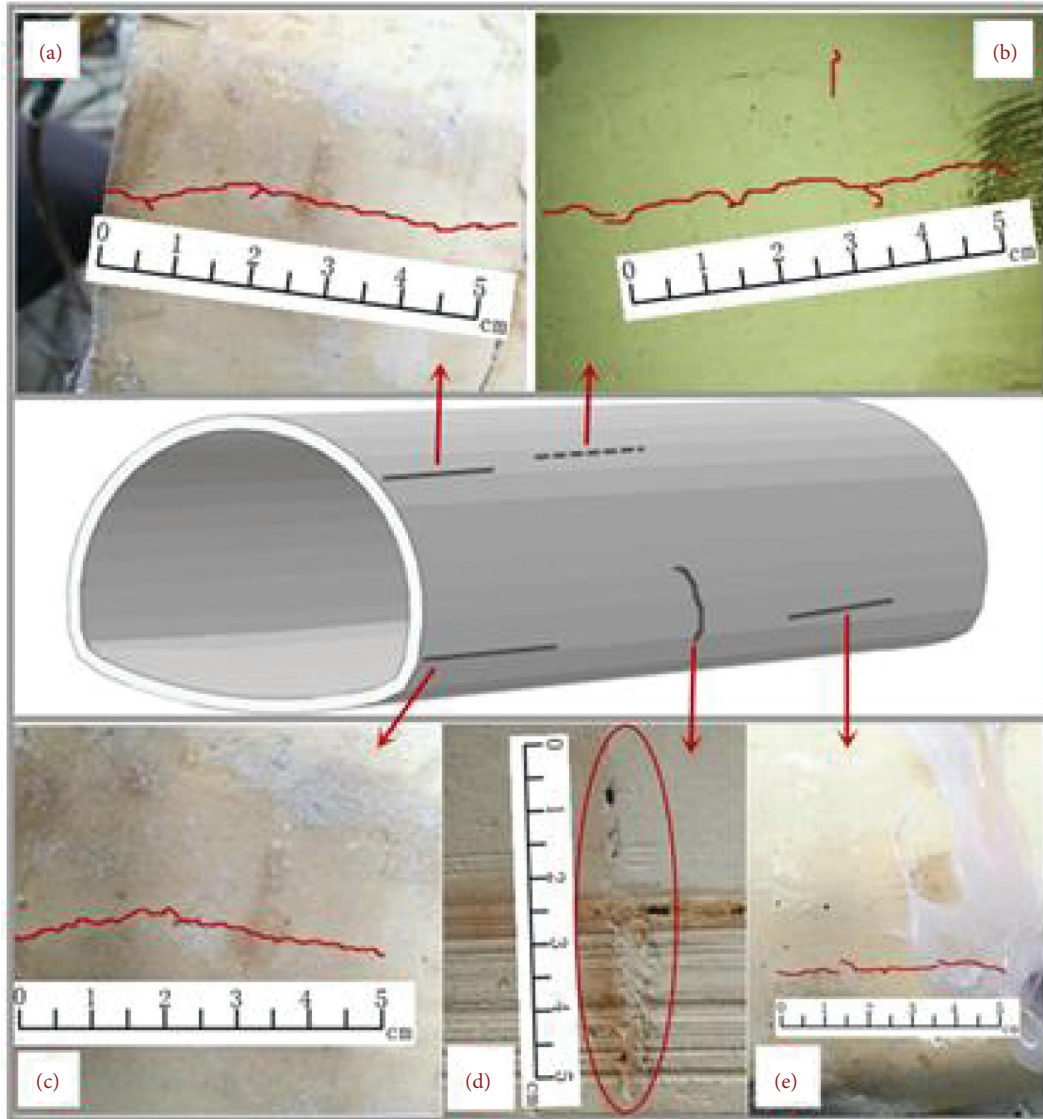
Lining crack. (a) Cracks in left skewback of bias section. (b) Cracks in right skewback of bias section. (c) Longitudinal cracks at right spandrel of portal section. (d) Ring crack of right spandrel in bias section. (e) Longitudinal crack of right spandrel in bias section.
